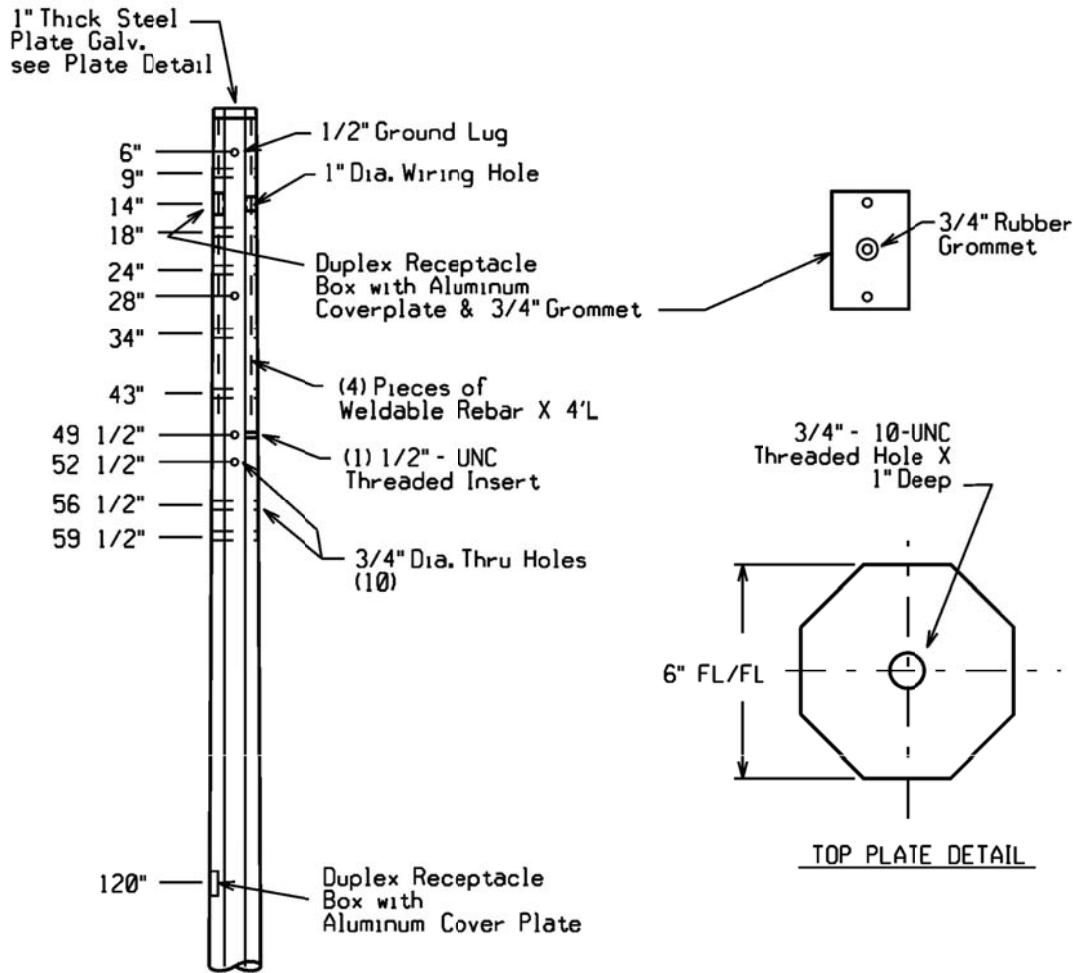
Metropolitan Pre-stressed Concrete Pole – Pole Top Detail
